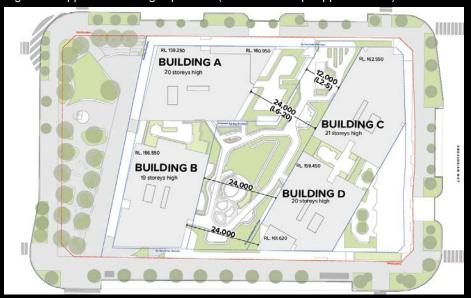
Approved building separation (Source: Concept Approval UDG)
